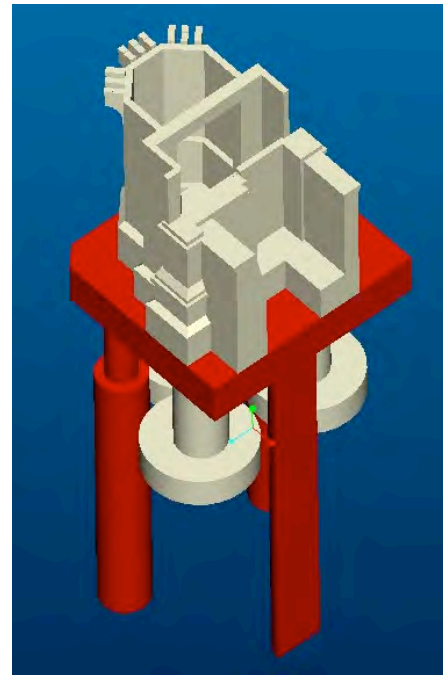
Computer Rendering Showing a Half Pier View with New Drilled Shafts and Footing
